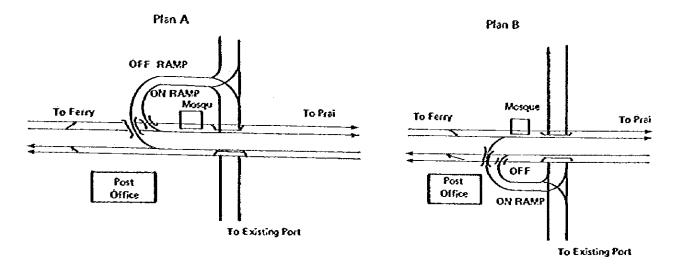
ALTERNATIVE INTERSECTION PLANS
